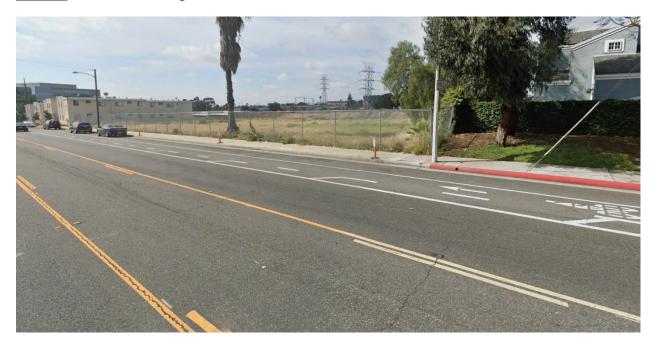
Street view facing North toward 1721 W. 120th St.
